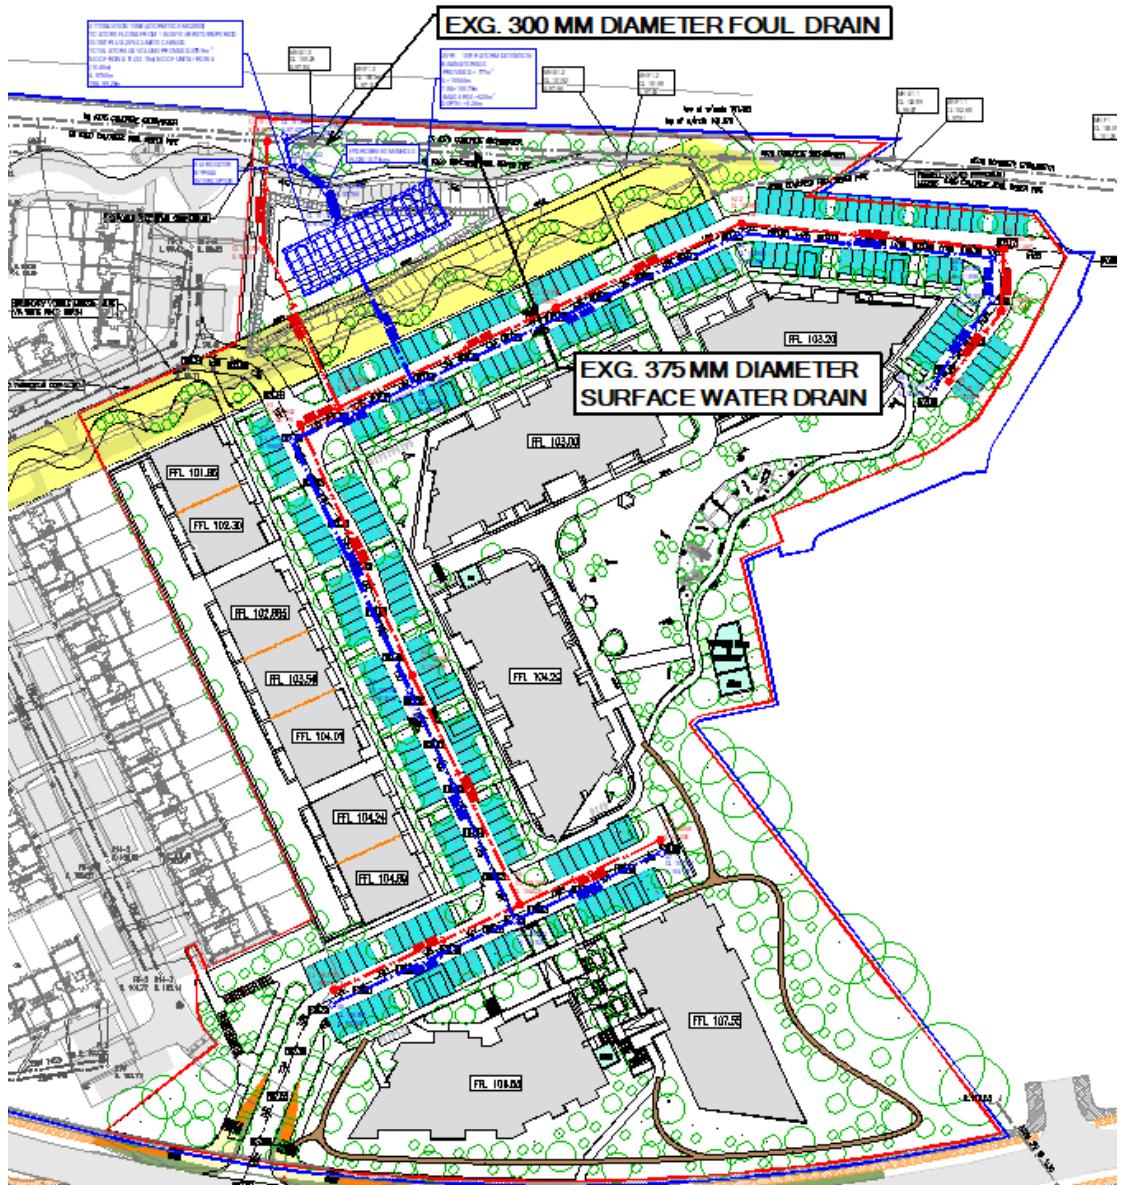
Existing Surface Water Drain – Northern Site Boundary.
